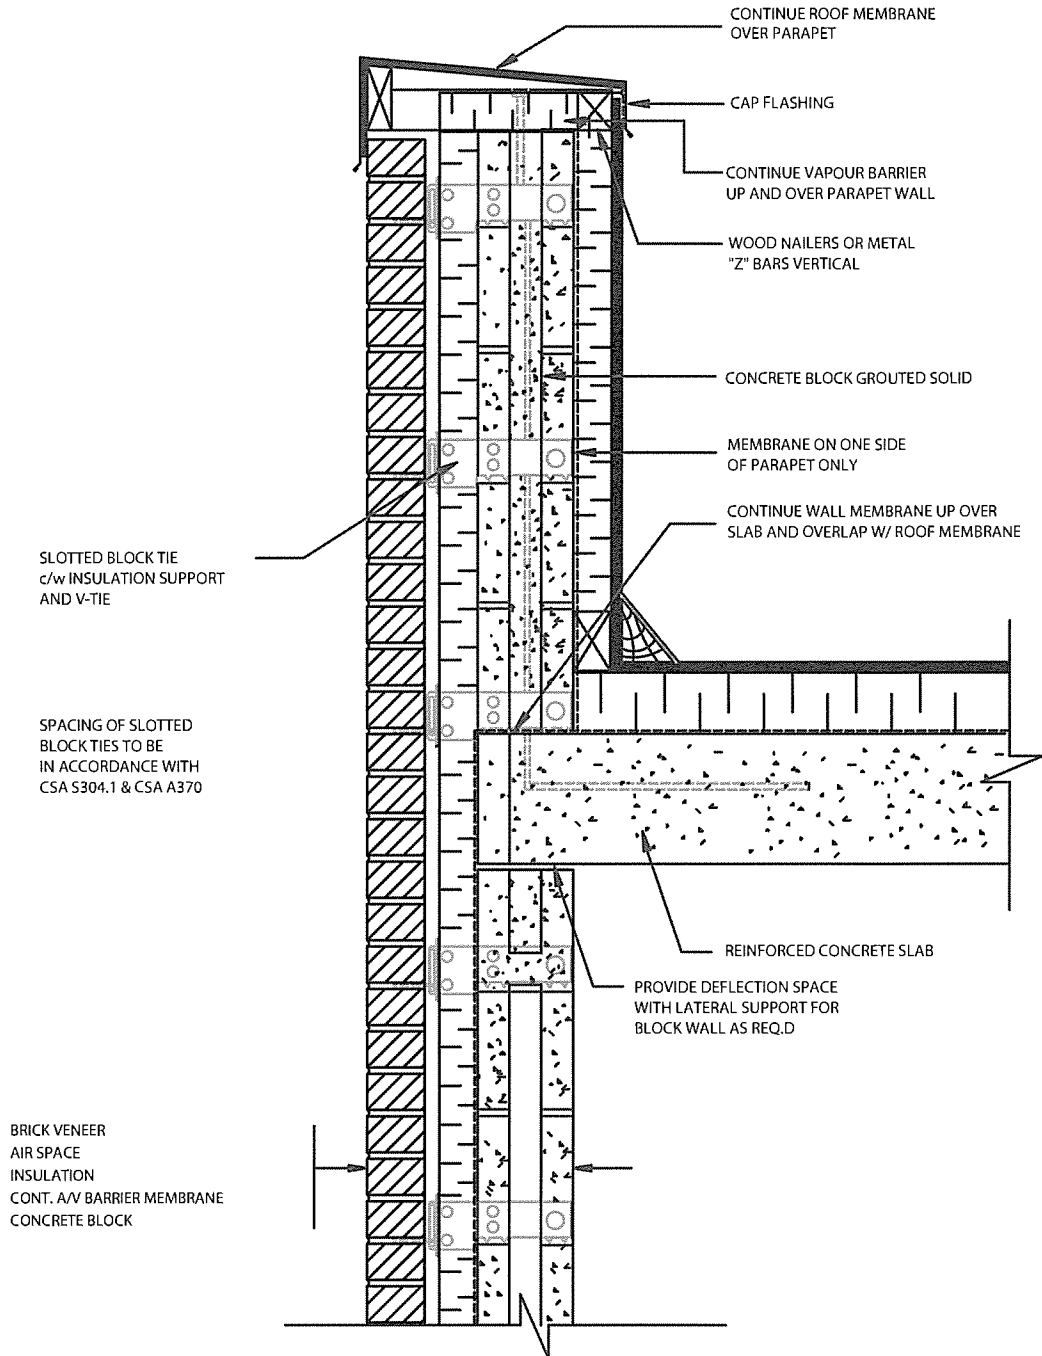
BRICK VENEER/CONCRETE BLOCK-DETAIL AT HIGH PARAPET
